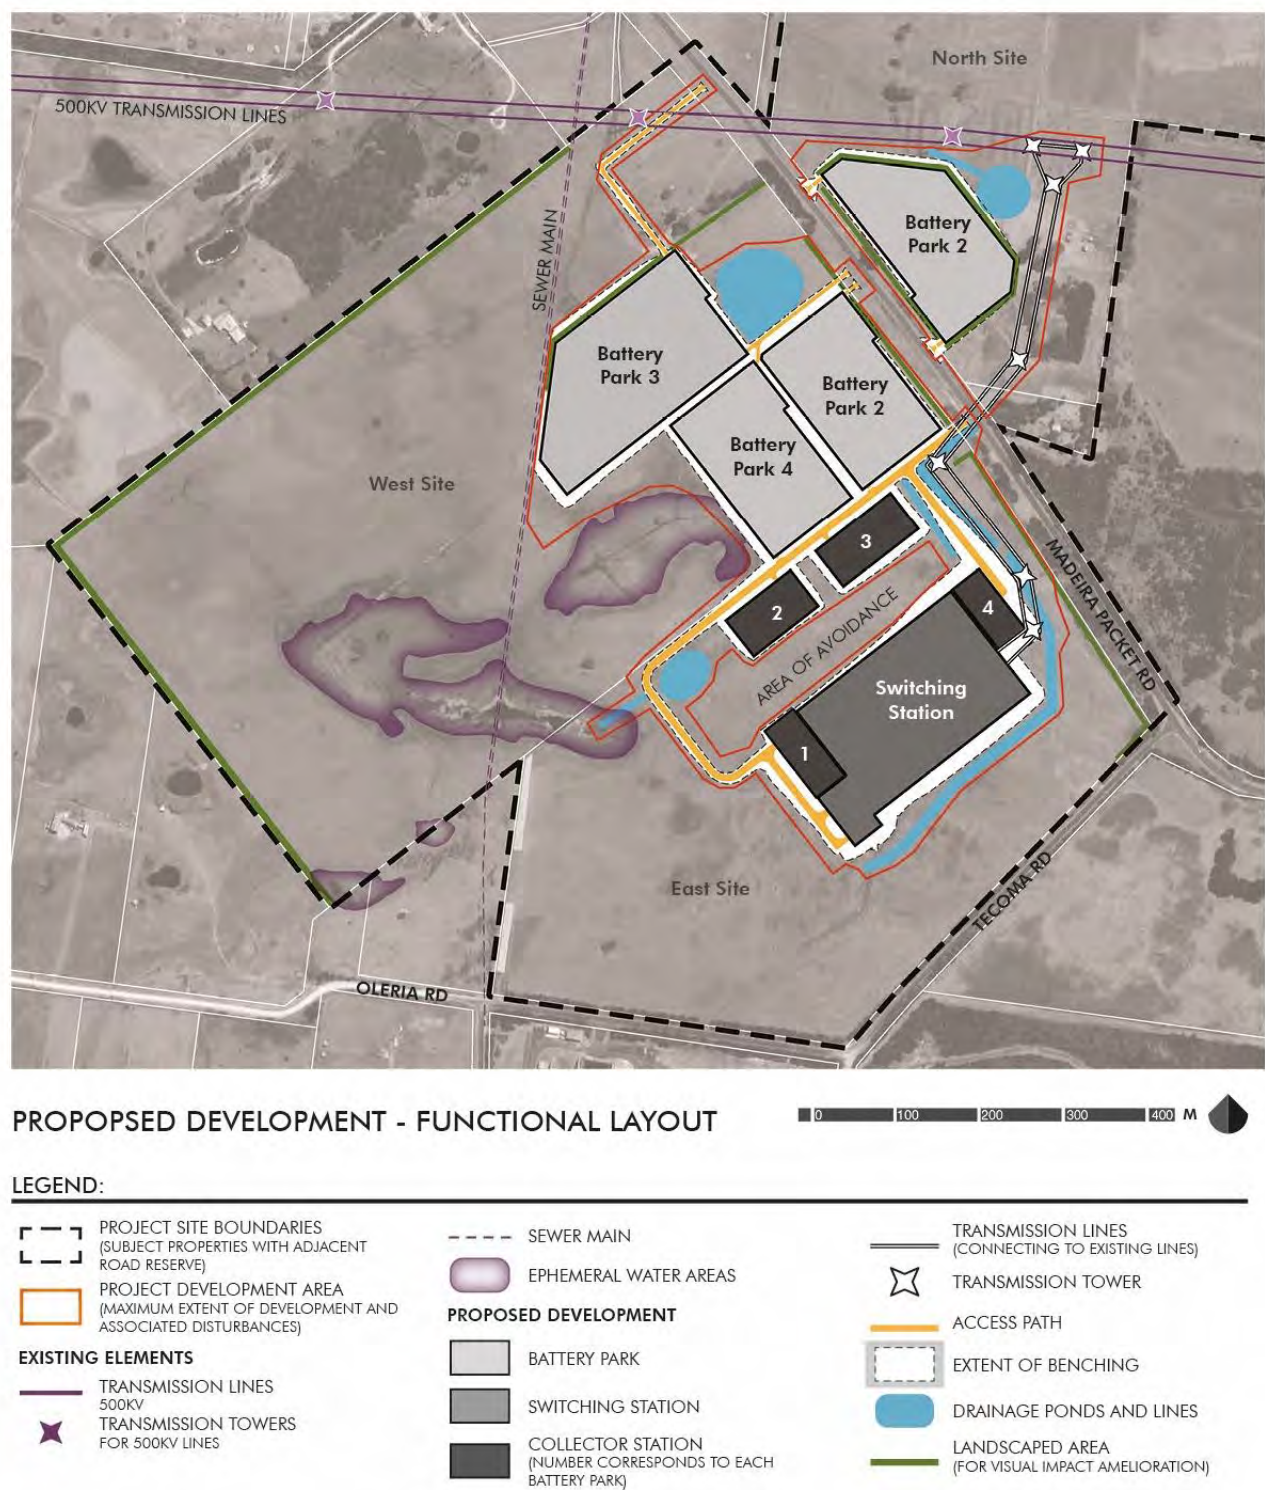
Final concept layout plan for the proposed Portland Energy Park
